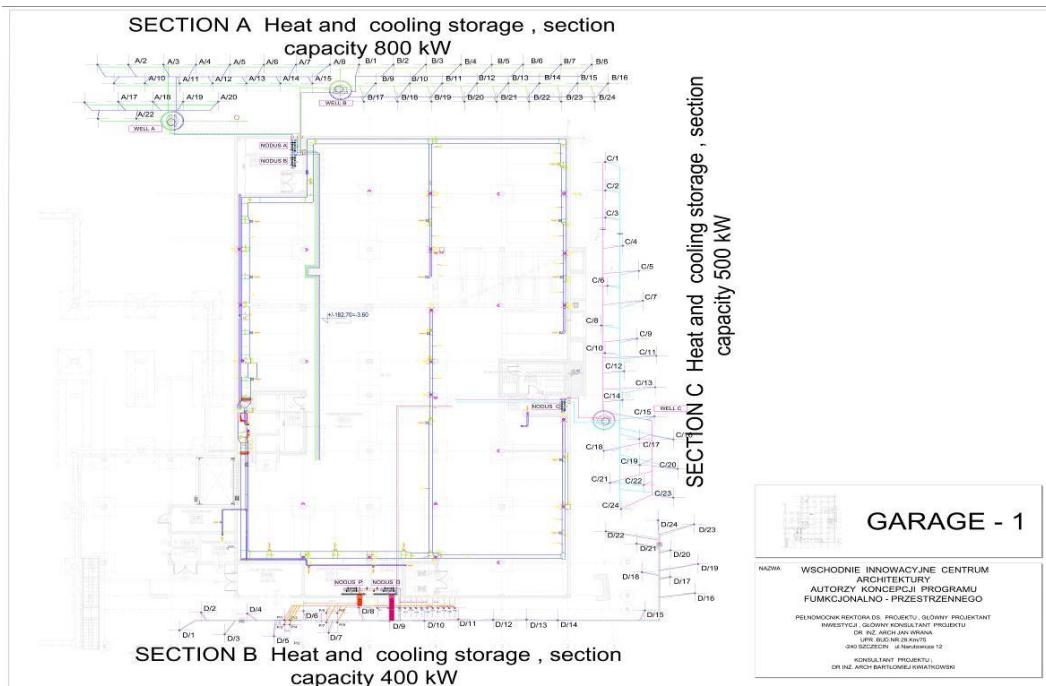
Under-ground floor plan, well zone. Source: Lublin University of Technology (the concept).
